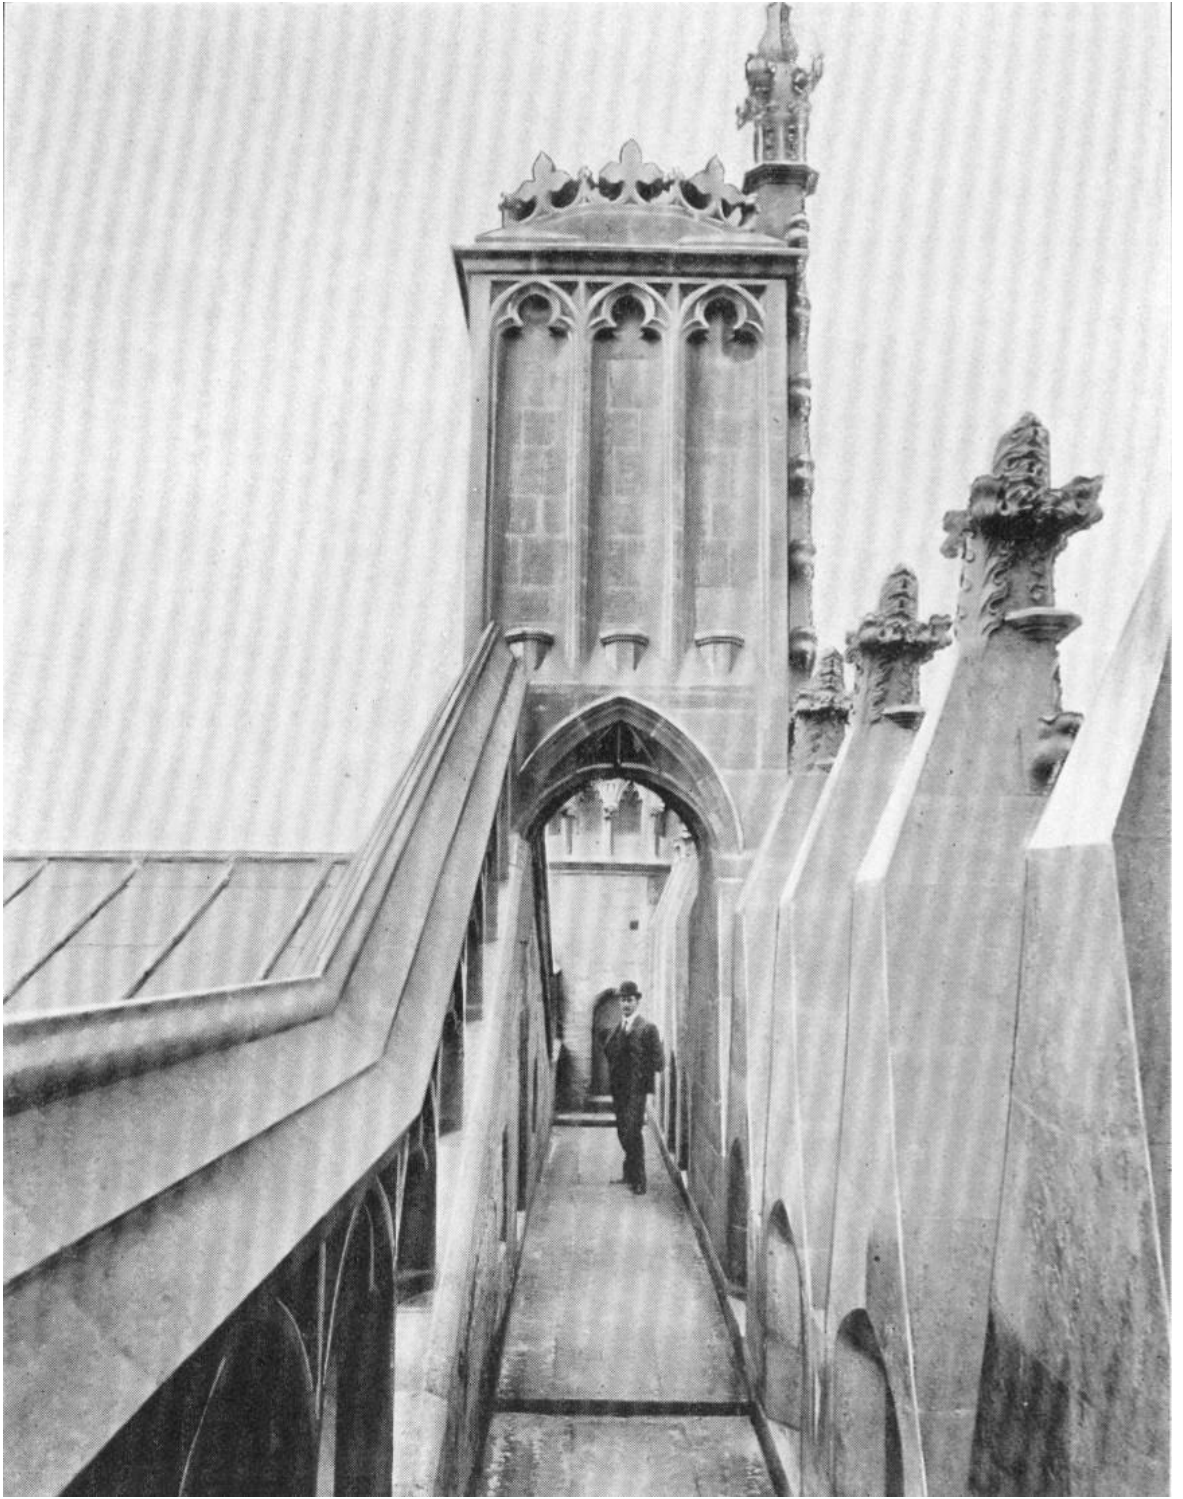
East Front parapet looking north after renewal (Purey-Cust 1901, 11)
